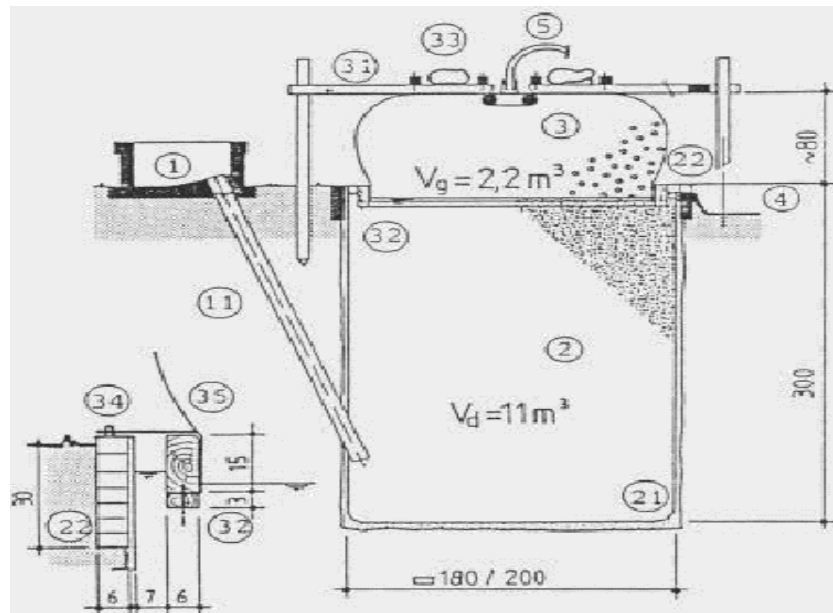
Balloon type biogas plant (Sasse 1988)
